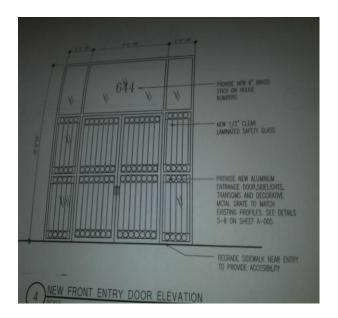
of 2 - Inadequacies - Plans Front Entrance
